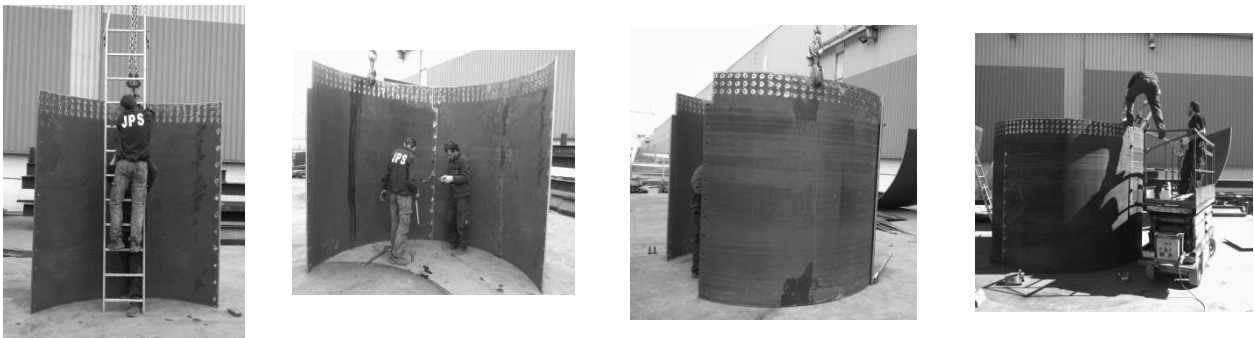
Assembly of the lower segment (20mm thick connection)
